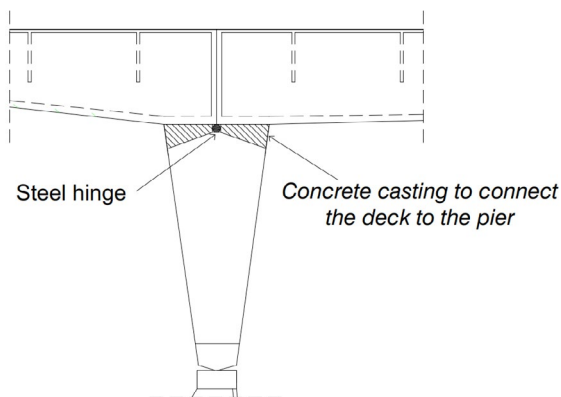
Detail of temporary support made of steel cylinder for applying prestressing.
